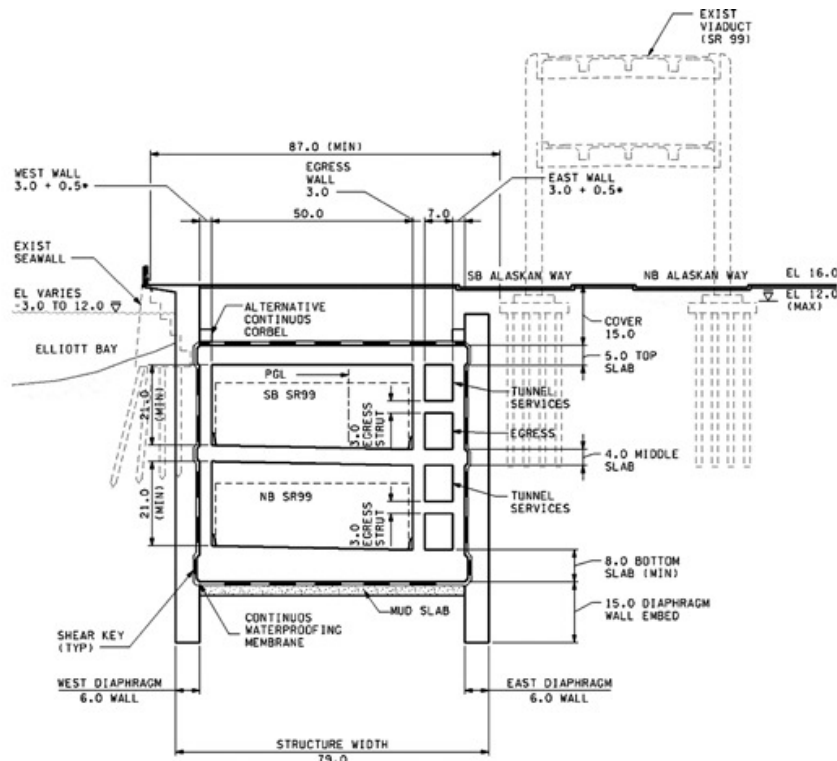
Typical Section of Proposed Stacked Alaskan Way Tunnel [Kirandag et al. 2007]
